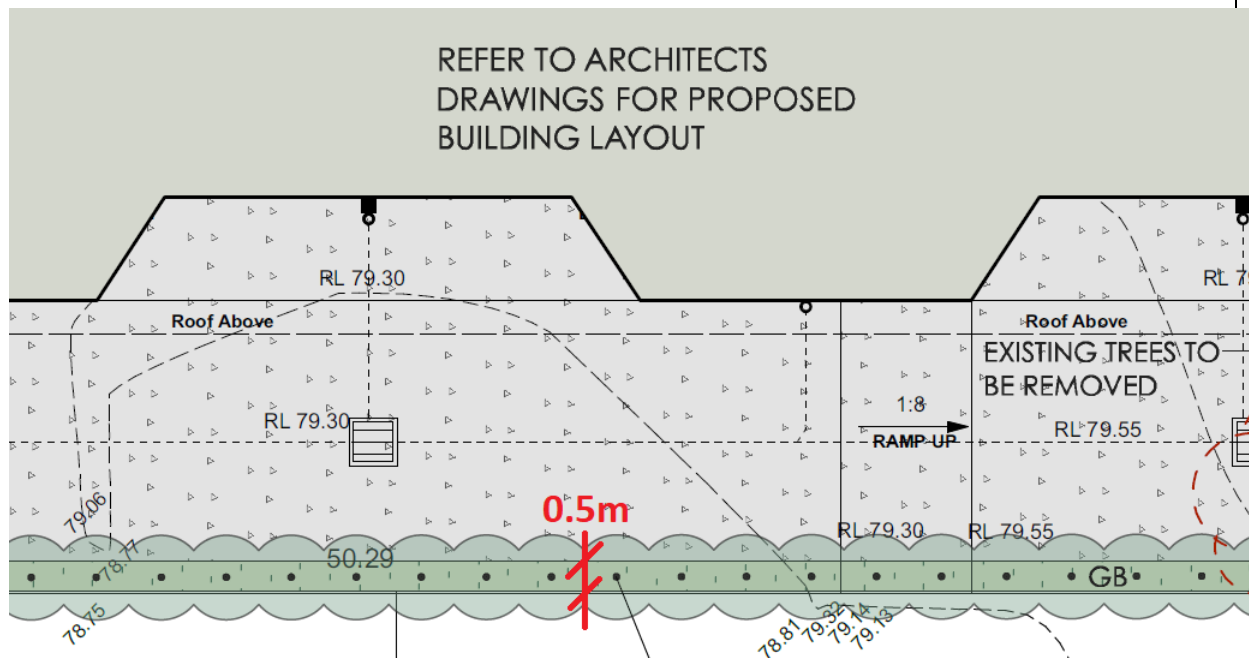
Landscape Plan extract indicating insufficient planting bed width adjacent the driveway and failure to provide any planting between the driveway and dwelling façade.
